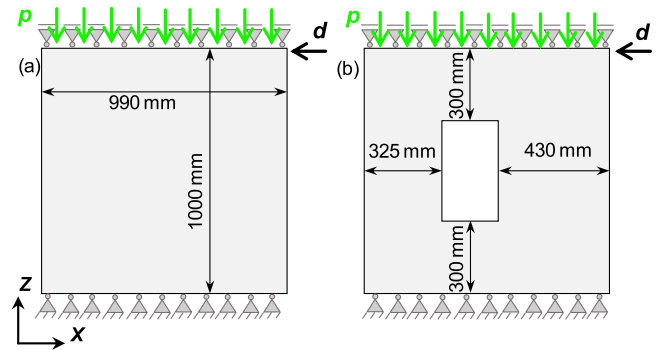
Geometry and test configuration for: (a) walls J4D and J5D, (b) window walls J2G and J3G.
